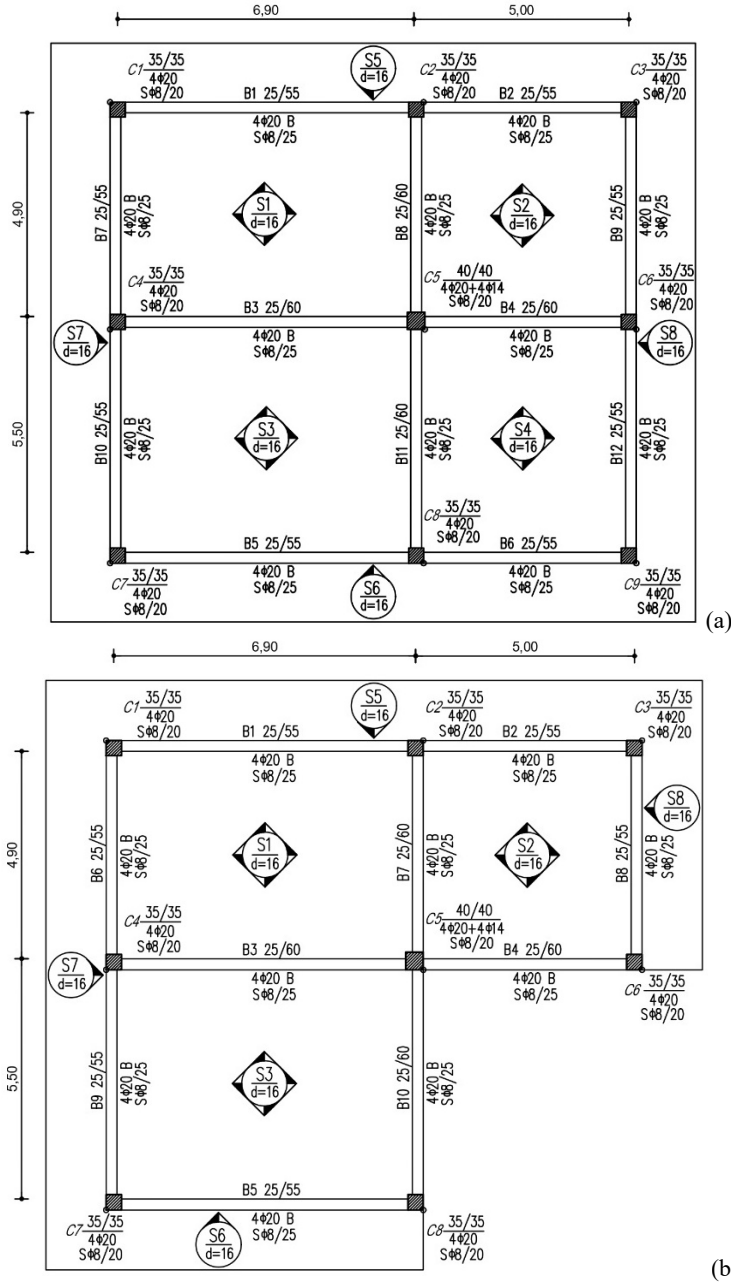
Structural floor-plans of the two buildings: (a) Building A and (b) Building B
